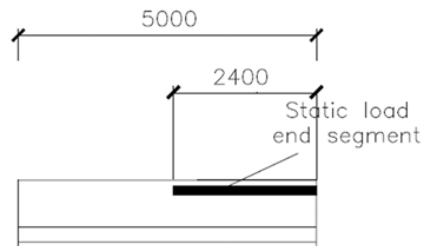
Elevation of the 5-m long bridge barrier loaded at the end location (units in mm)
